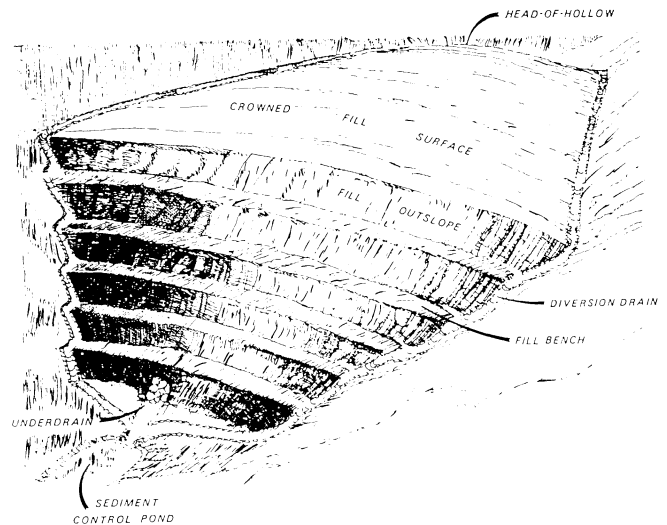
Sketch showing typical head-of-hollow fill structure (Anon., 1979).
